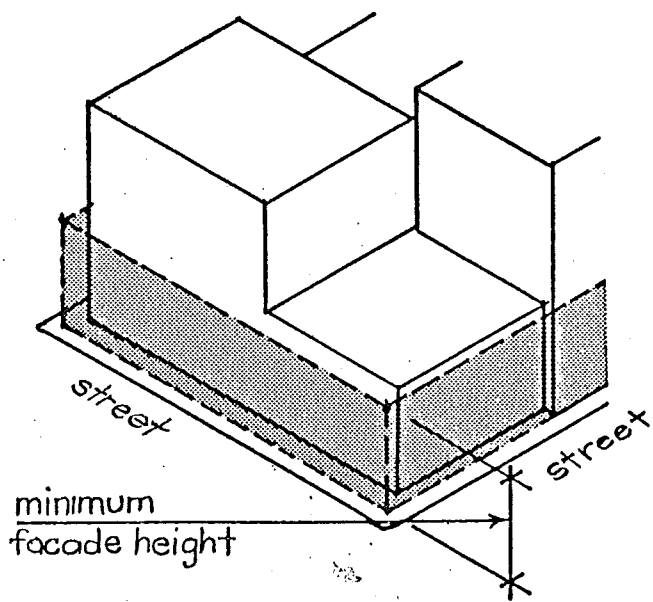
A MINIMUM FACADE HEIGHT
